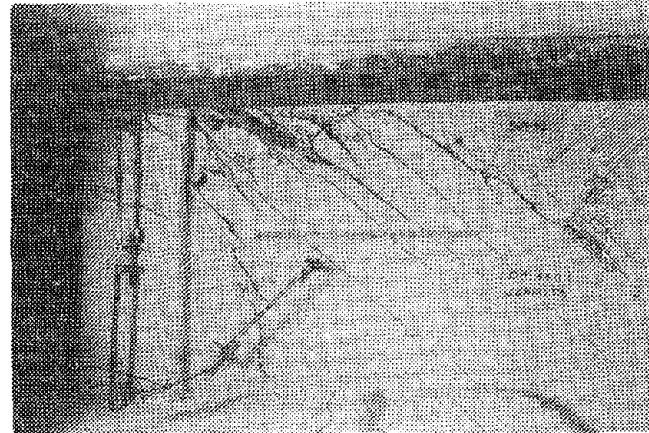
CRACKS EXTENDING FROM UPPER NORTH CORNER OF THIRD-STORY WALL PANEL TO FACE OF SECOND-STORY SLAB OF SPECIMEN SW7 R<sub>2</sub>. LP 450.
